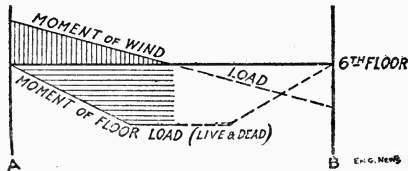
GRAPHICAL COMBINATION OF MOMENTS FROM VERTICAL LOADS AND WIND LOADS IN FLOOR GIRDER
